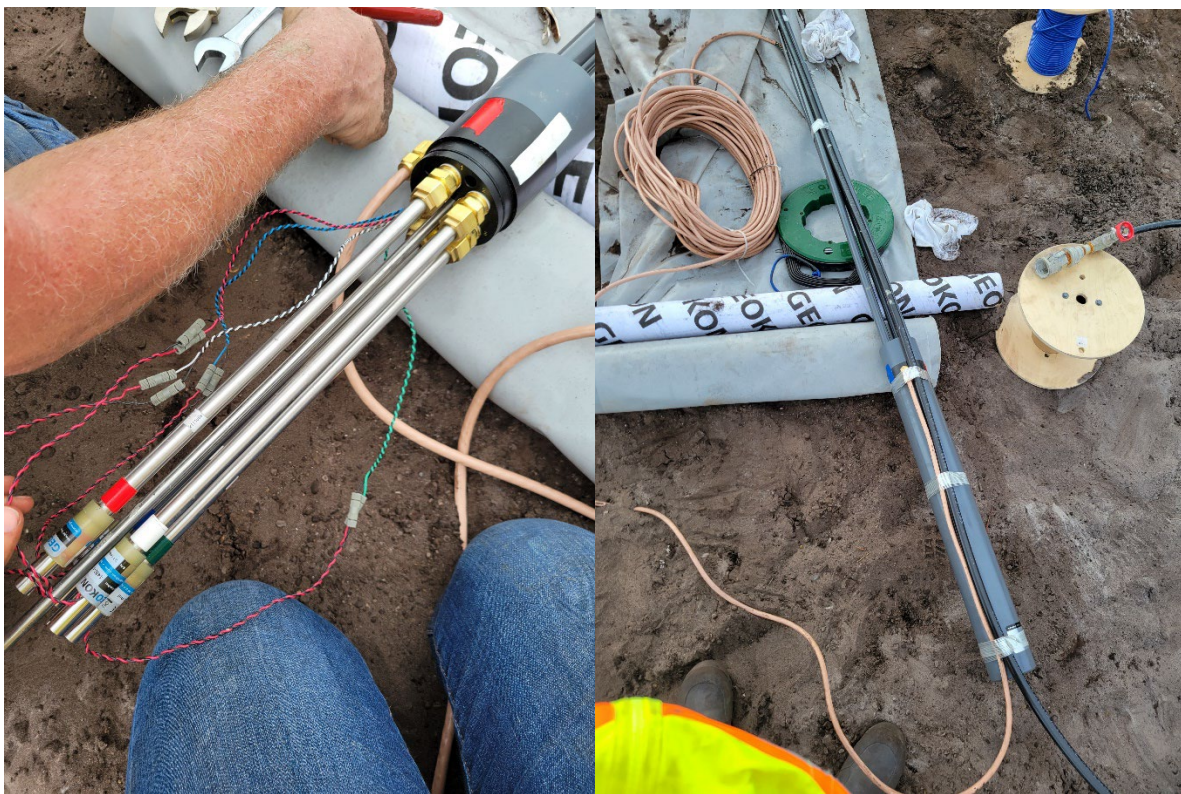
Four extensometers connected to settlement head unit before and after installing water-tight protective shroud.
